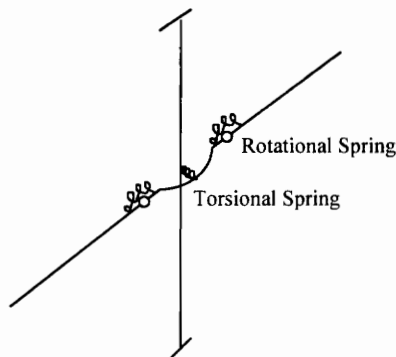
Suggested Beam-to-Column Joint Model
